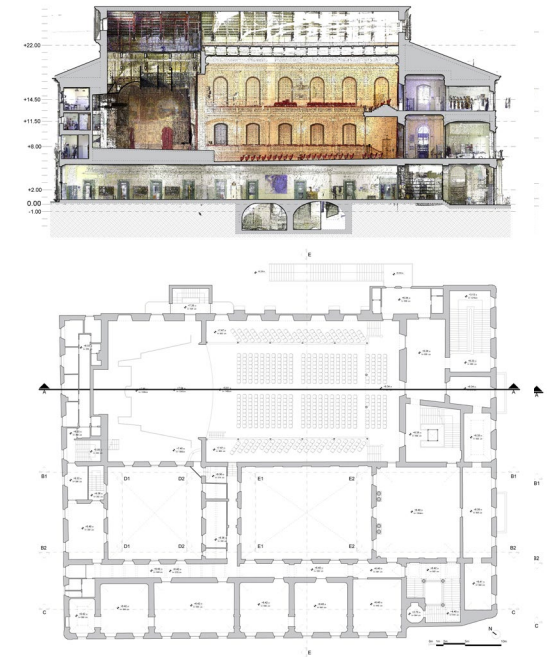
Two-dimensional drawings at 1:100 scale: longitudinal section AA and floor plan of the first level. Both show the Auditorium Pedrotti space.
